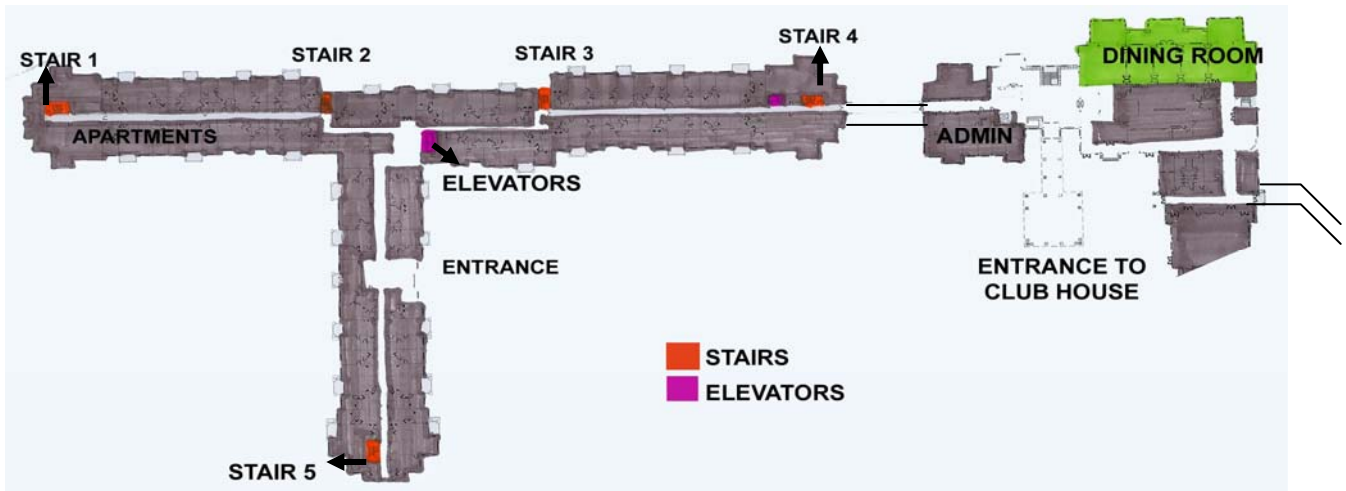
plan of 4th floor of the West Village and the main floor of the clubhouse
